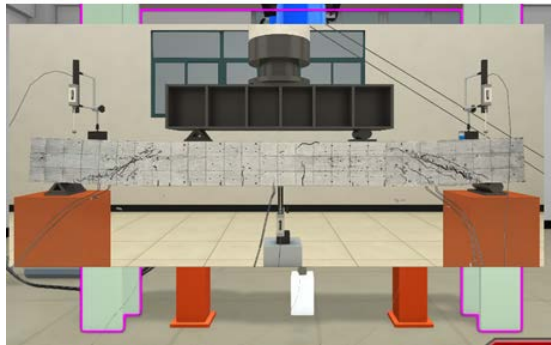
Virtual Simulation Project of Inclined Section Shear Test of Reinforced Concrete Beams
